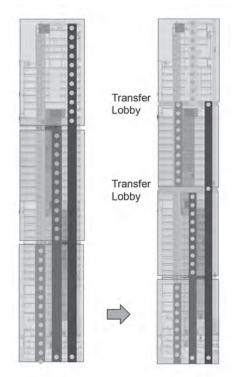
Lift arrangement with stacked shafts and shuttles (Source: thyssenkrupp Elevator) 图2. 叠置井道和电梯的空间布置(来源:蒂森克虏伯 电梯集团)
